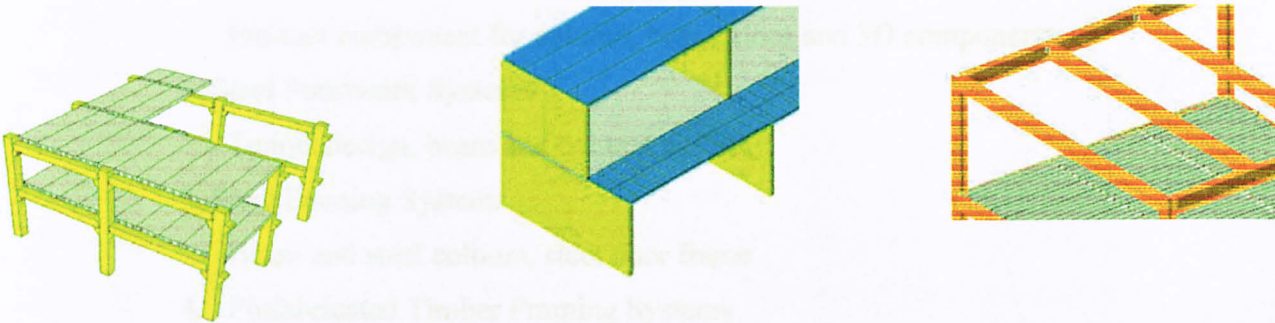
(a). Skeletal precast concrete framed structure (b). Precast concrete Wall (c). Steel framed structure
